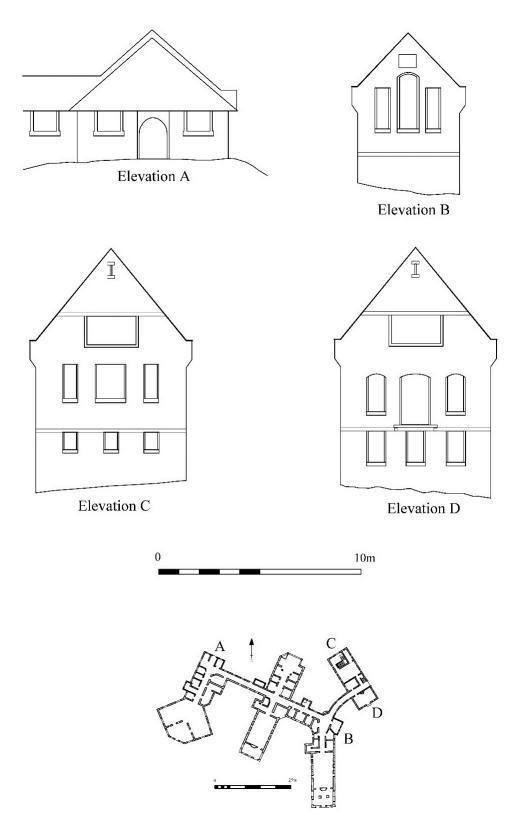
Selected elevations of mid-20th century wards Key to location of the elevations on inset plan
